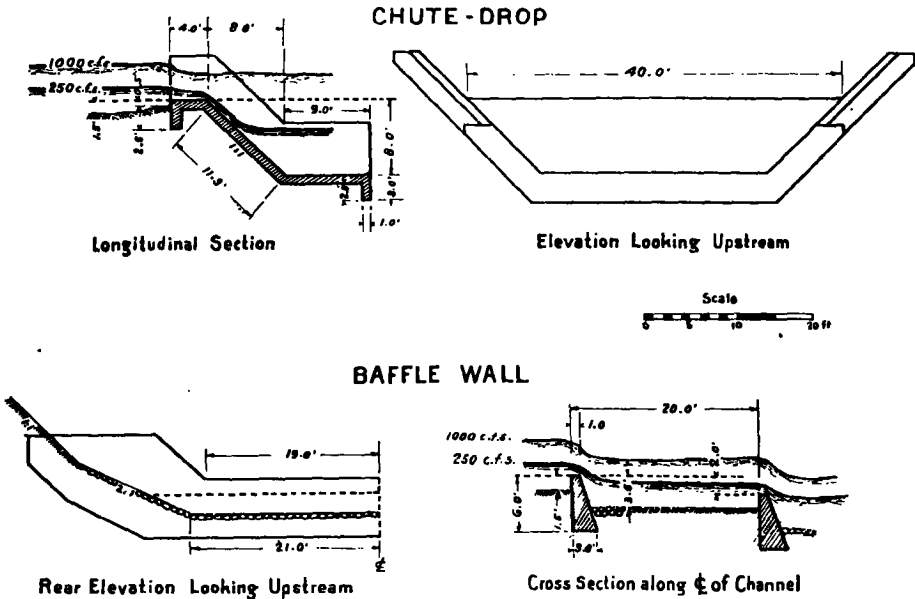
SKETCH DESIGN OF CHUTE-DROP AND BAFFLE-WALL SPILLWAY
